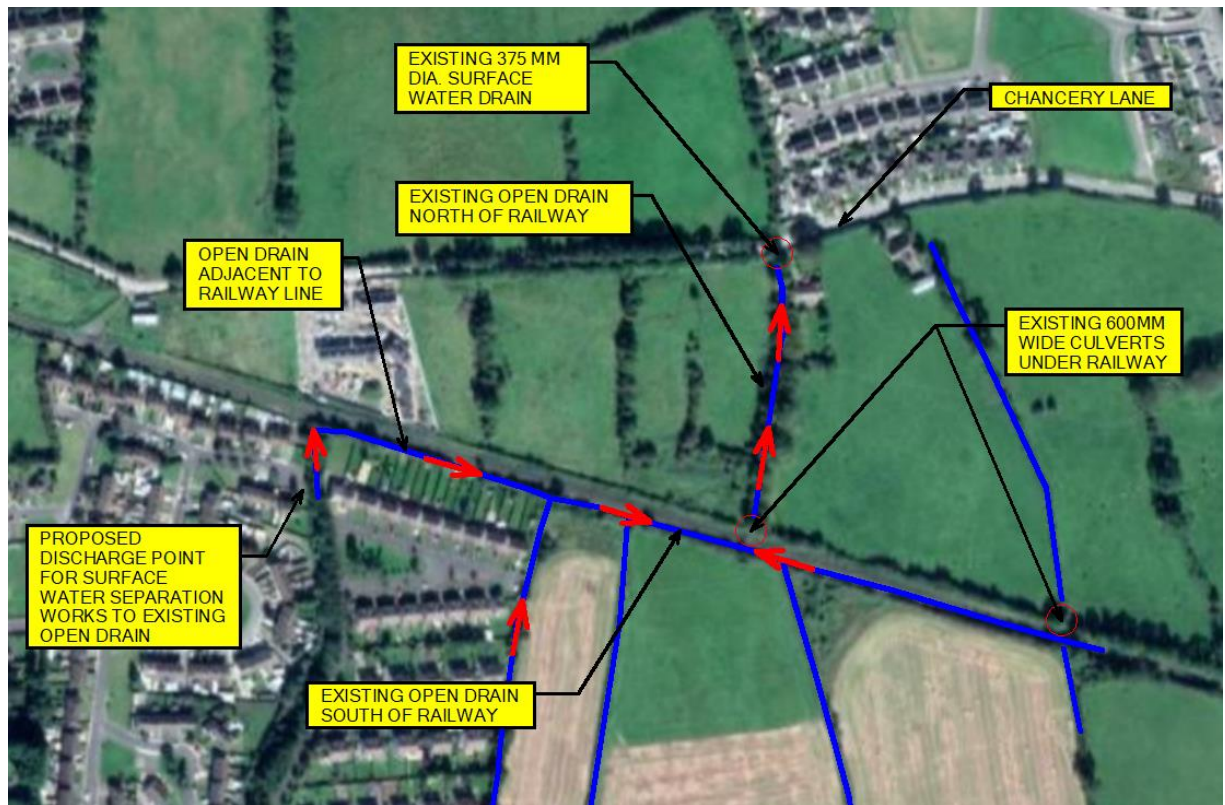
Outfall from Surface Water Separation Works at St. Columba's Place
